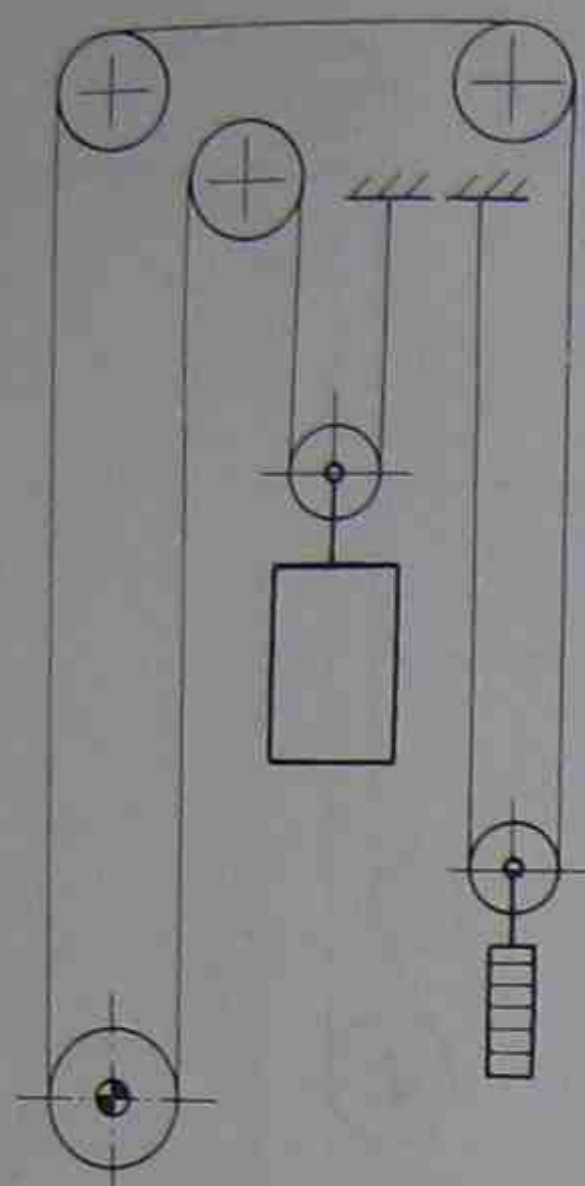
Roping system for basement position of the machine, single wrap drive, roping factor 2.
